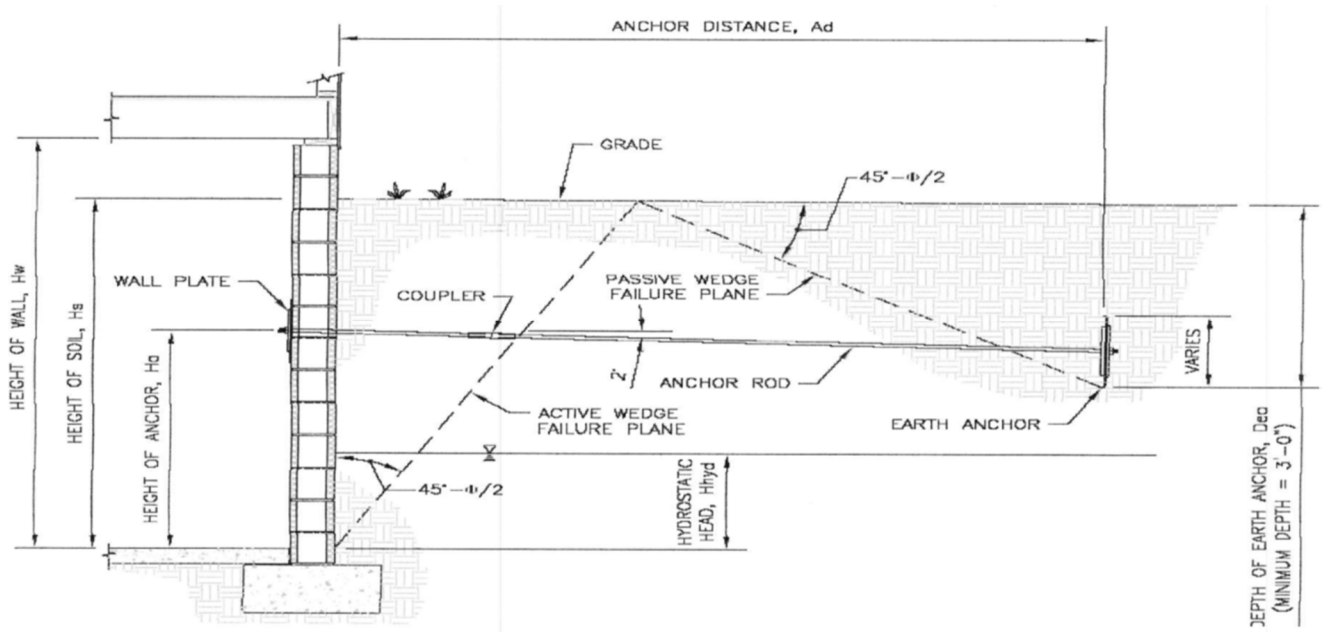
TYPICAL WALL ANCHOR ASSEMBLY
